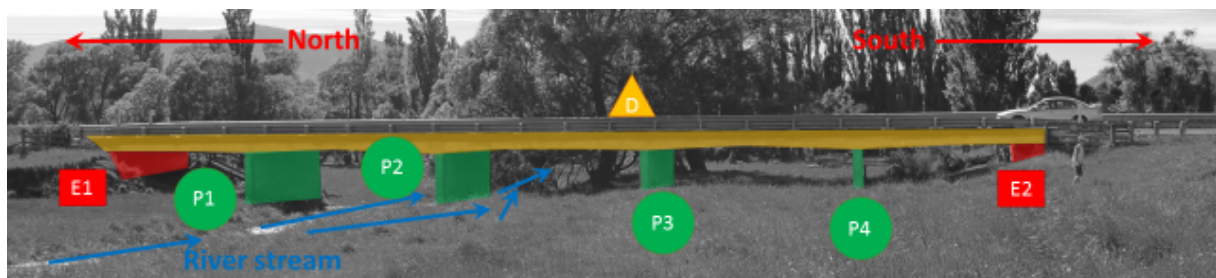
Layout of Needles Creek Bridge in elevation view.
